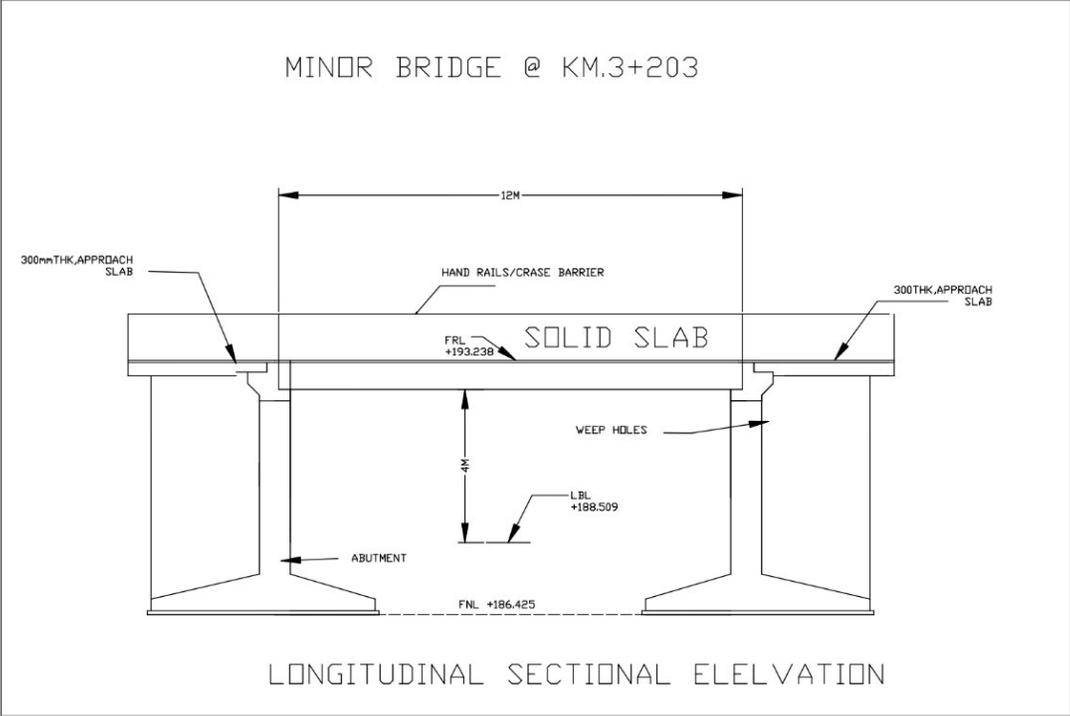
Longitudinal Section of MINOR BRIDGE @ Km.3+203
